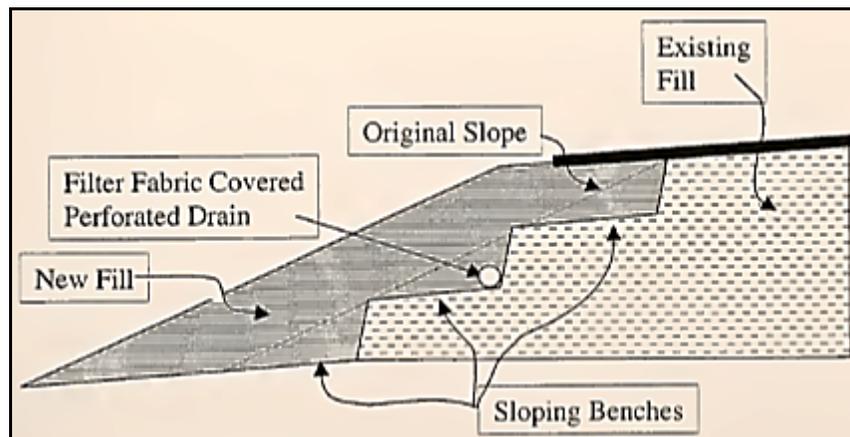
Recommended drain placement along vertical cut outside of pavement edge.
